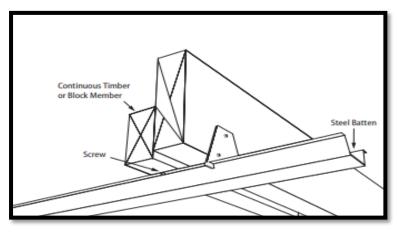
Sample of timber block requirement when using steel ceiling battens on a ceiling diaphragm.
